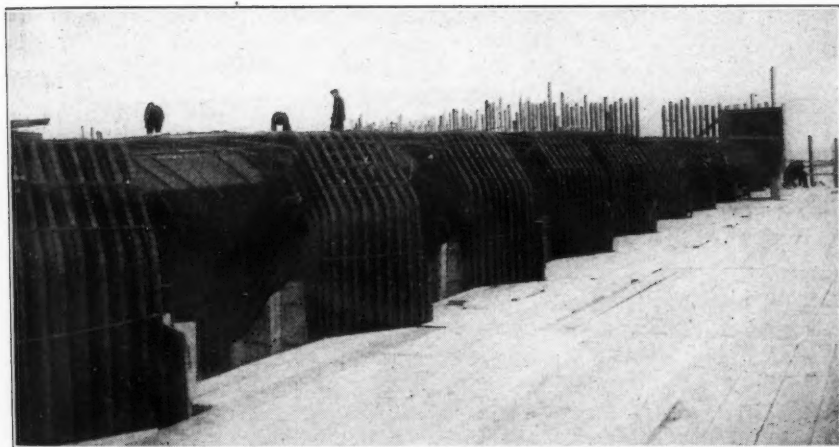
VIEW SHOWING REINFORCEMENT AT THE HAUNCH
